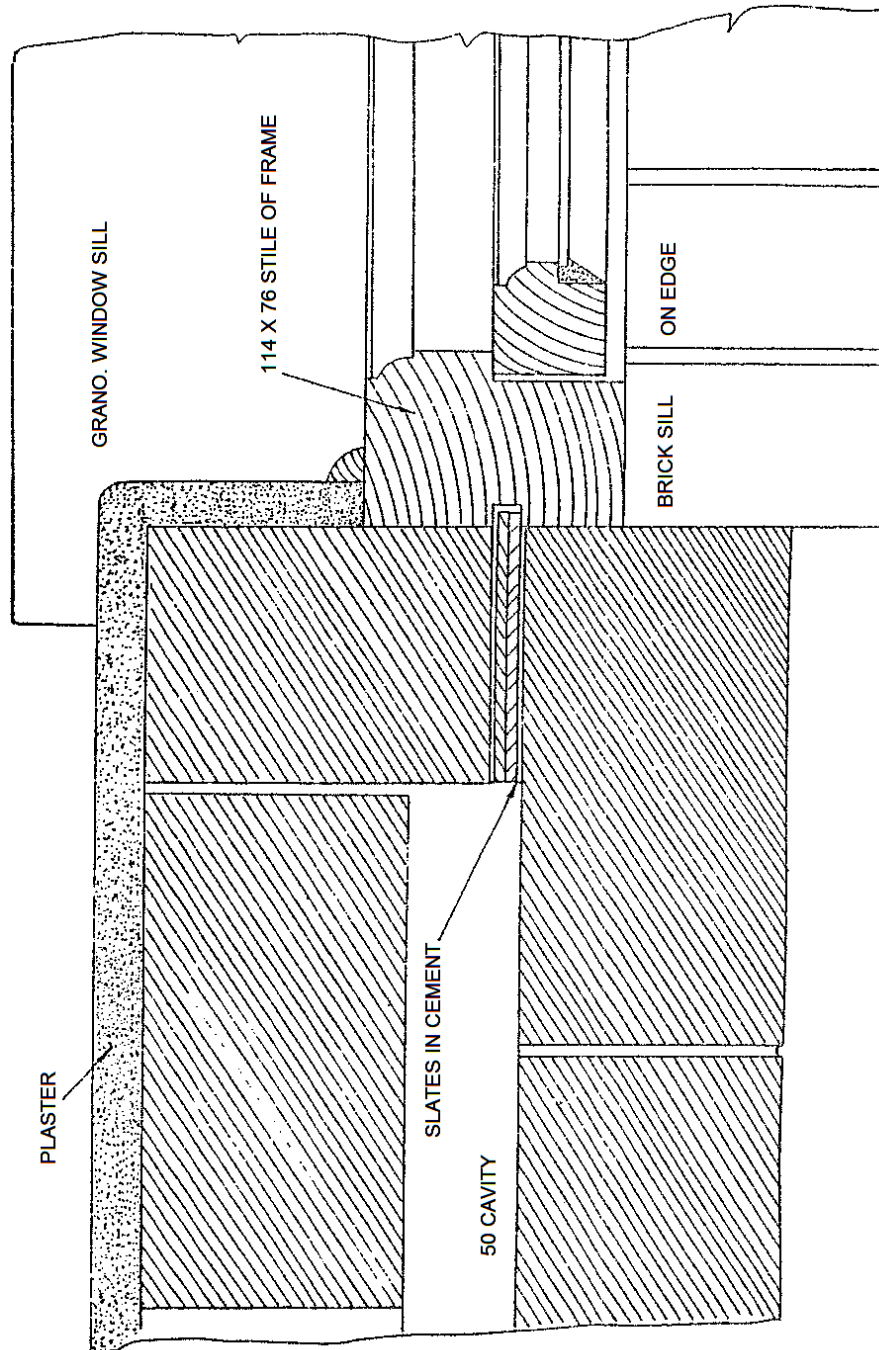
Section through 280 mm cavity wall showing the treatment at the jamb of the window
